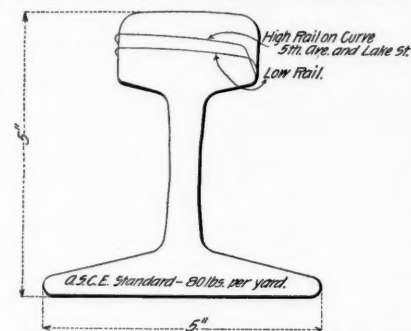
Wear of Rails in 13 Months on Union Elevated Railroad, Chicago.
